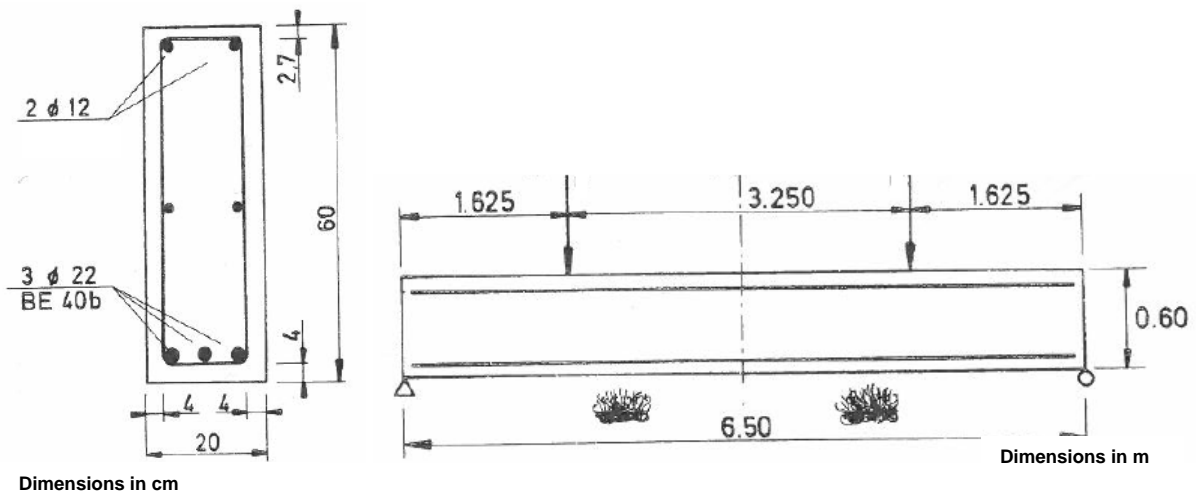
Reinforcement details of beams tested by Dotreppe [14]
